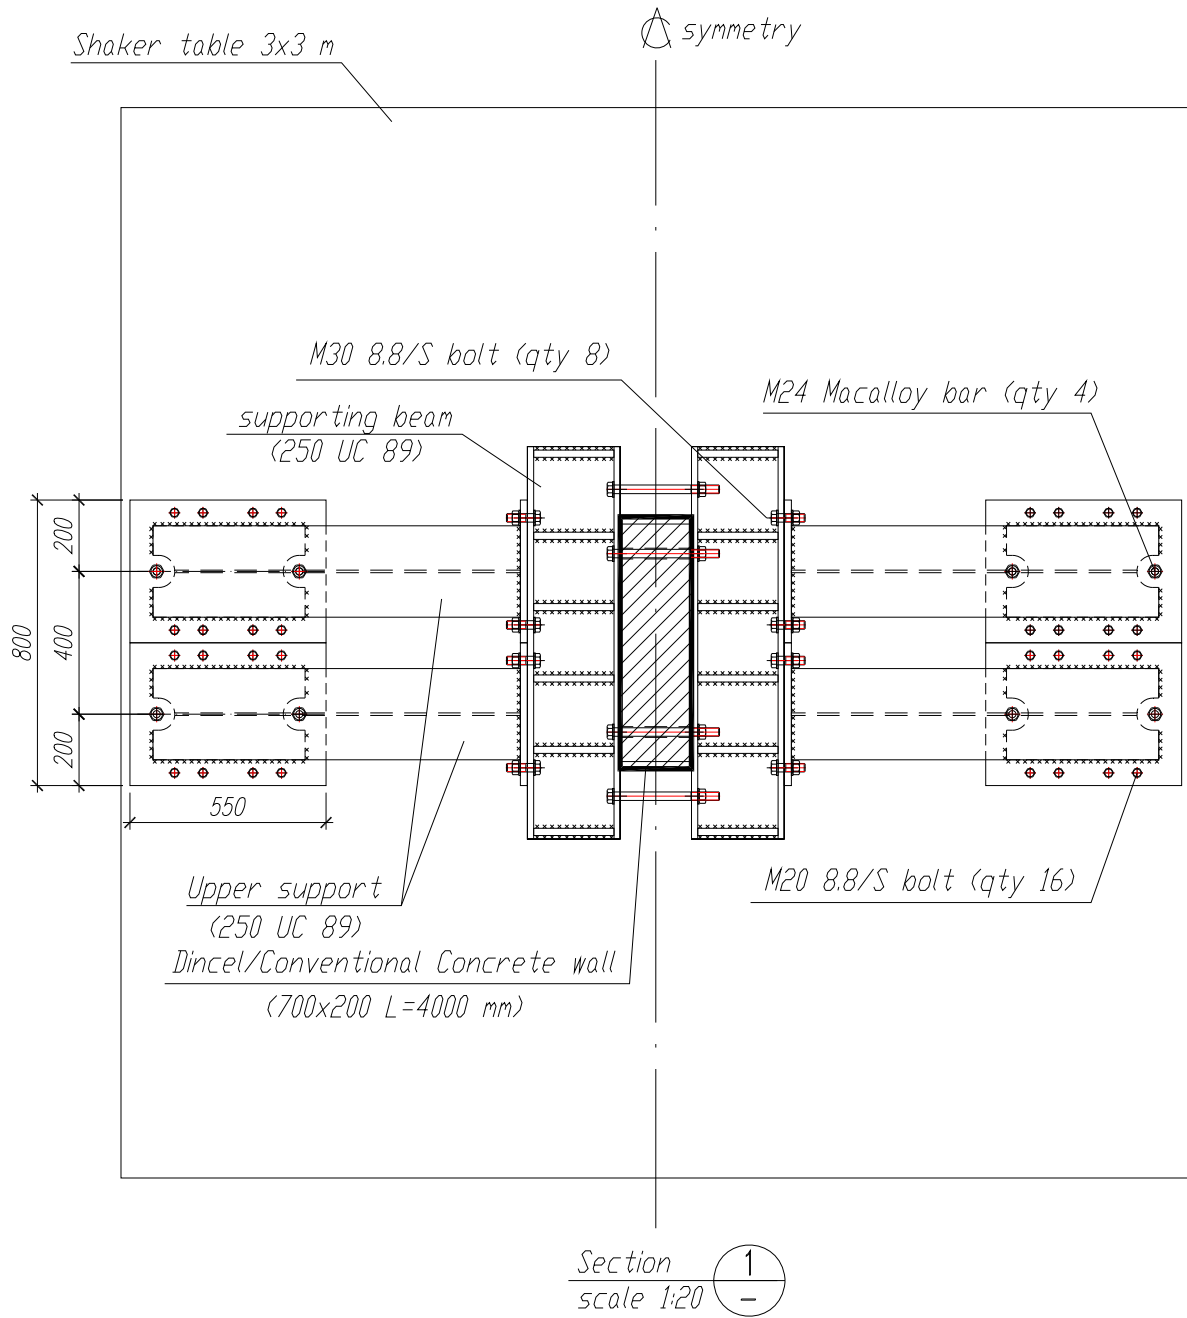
Dintel Wall Shake Table Testing Set up, section 1
